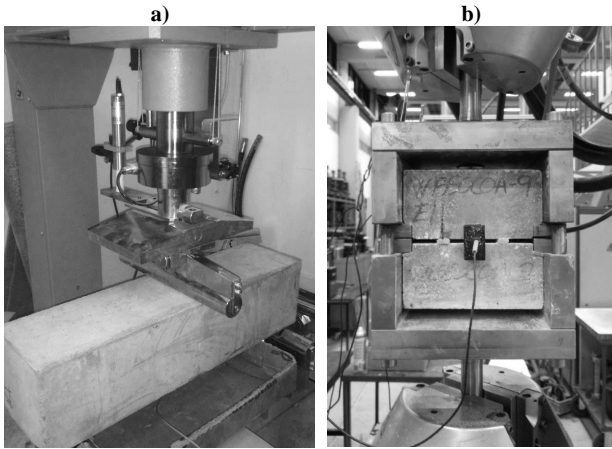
Test setups, mechanics: a) bending test, b) uniaxial tension test.
